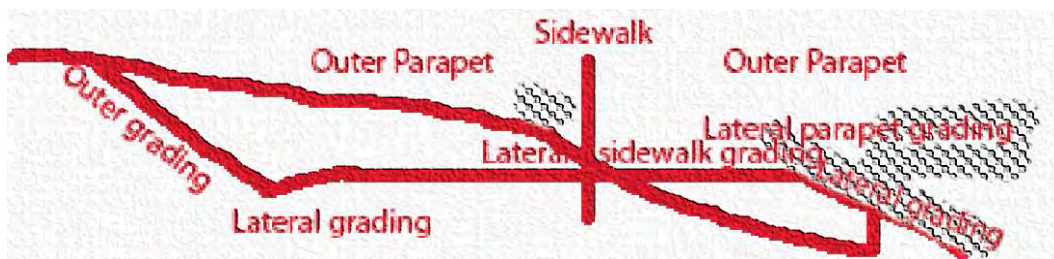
Cross section in non divided roads. Egyptian rule No. 159 of 1998. (the author)
